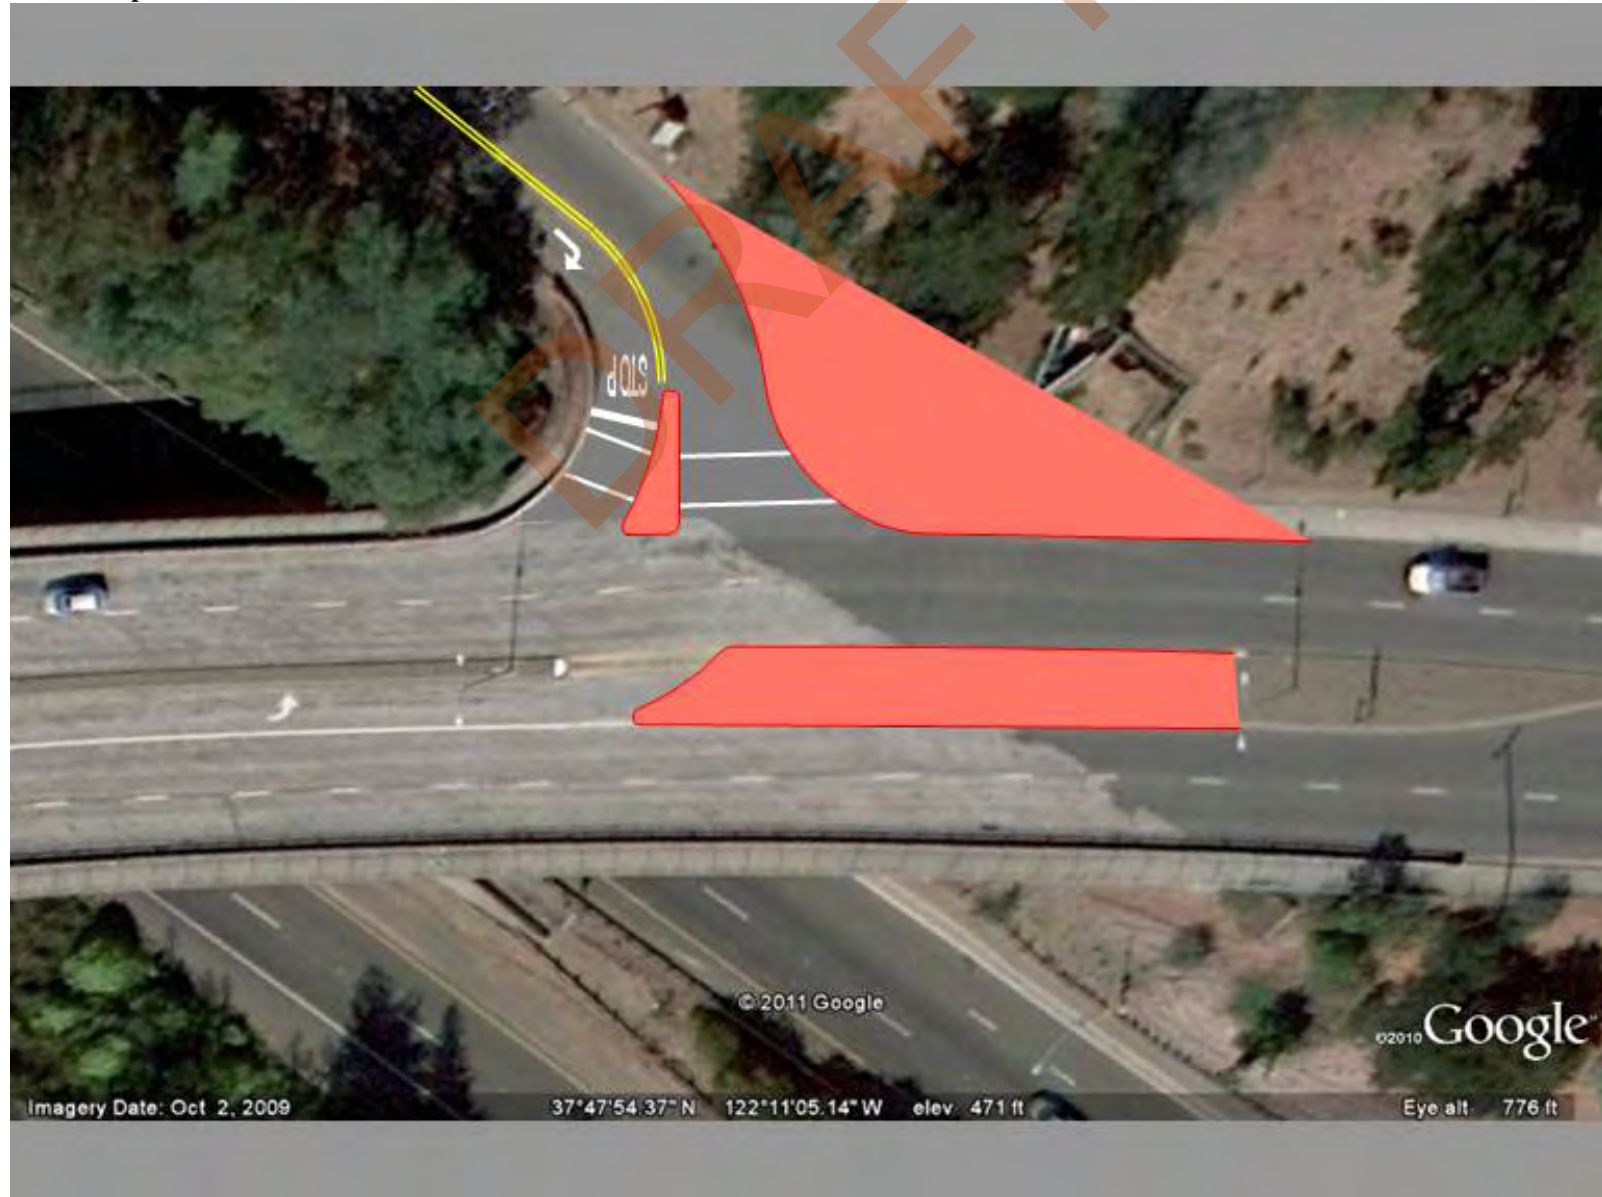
Proposed Remediation at Lincoln Square Driveway West and Redwood Road
